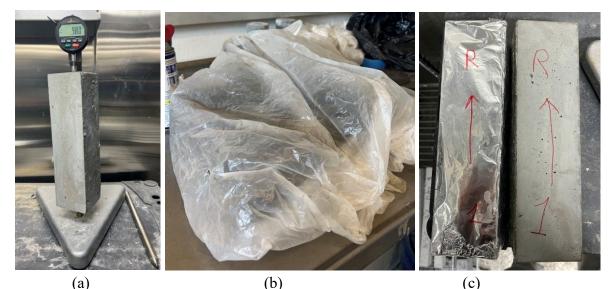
Shrinkage test set up (a) Length comparator; (b) Specimen curing after casting; and (c) Sealed and unsealed shrinkage specimens
